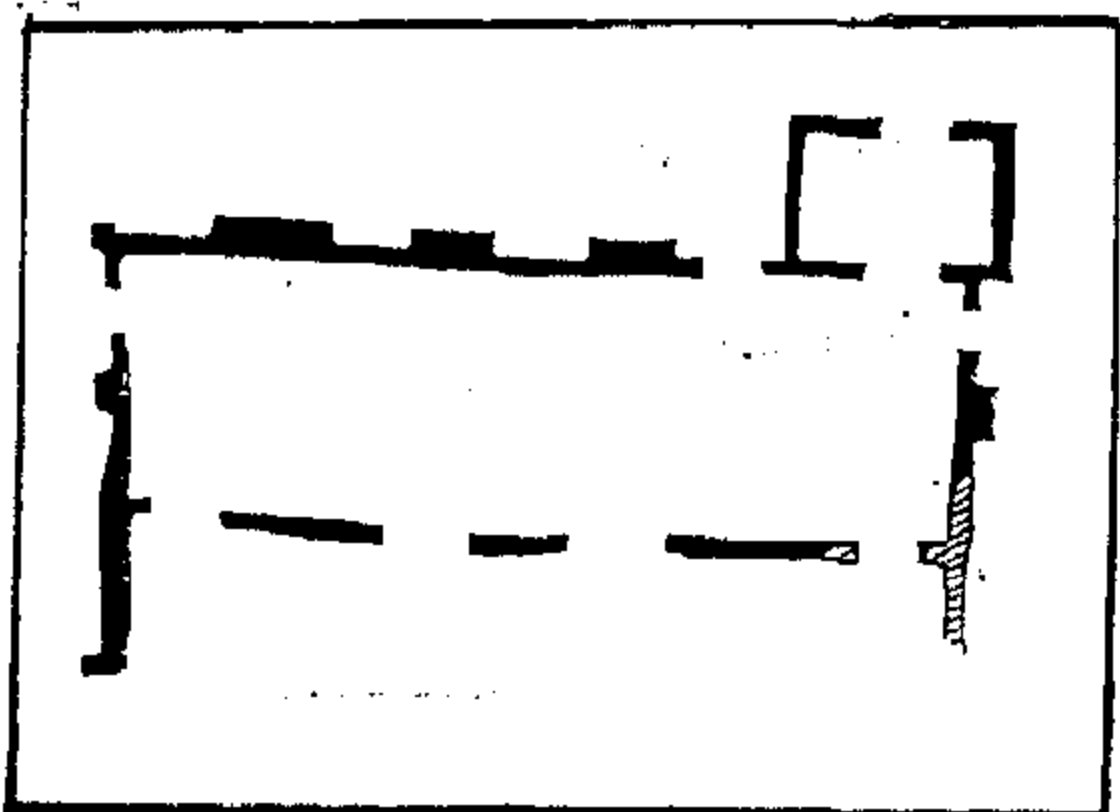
Plan of building at Tell el-'Oueili (after Forest 1983, p. 78).
